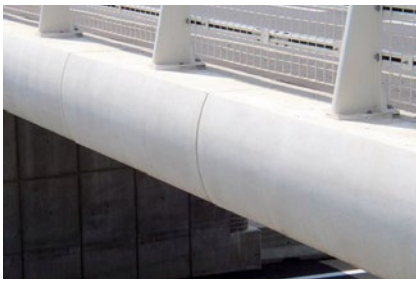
Highly stressed building components such as columns and beams are made of high strength concrete. High resistance to external influences also makes high strength concrete an ideal protective coating for exposed construction elements.
